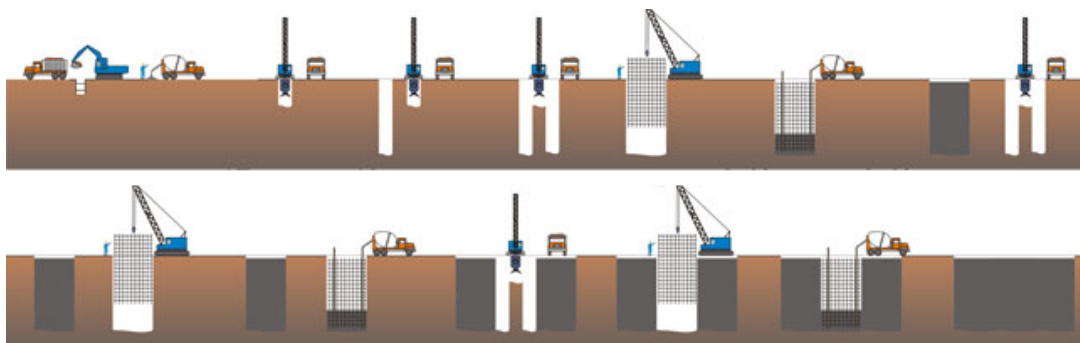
Construction Process of diaphragm wall [Tung Feng, 2009]
